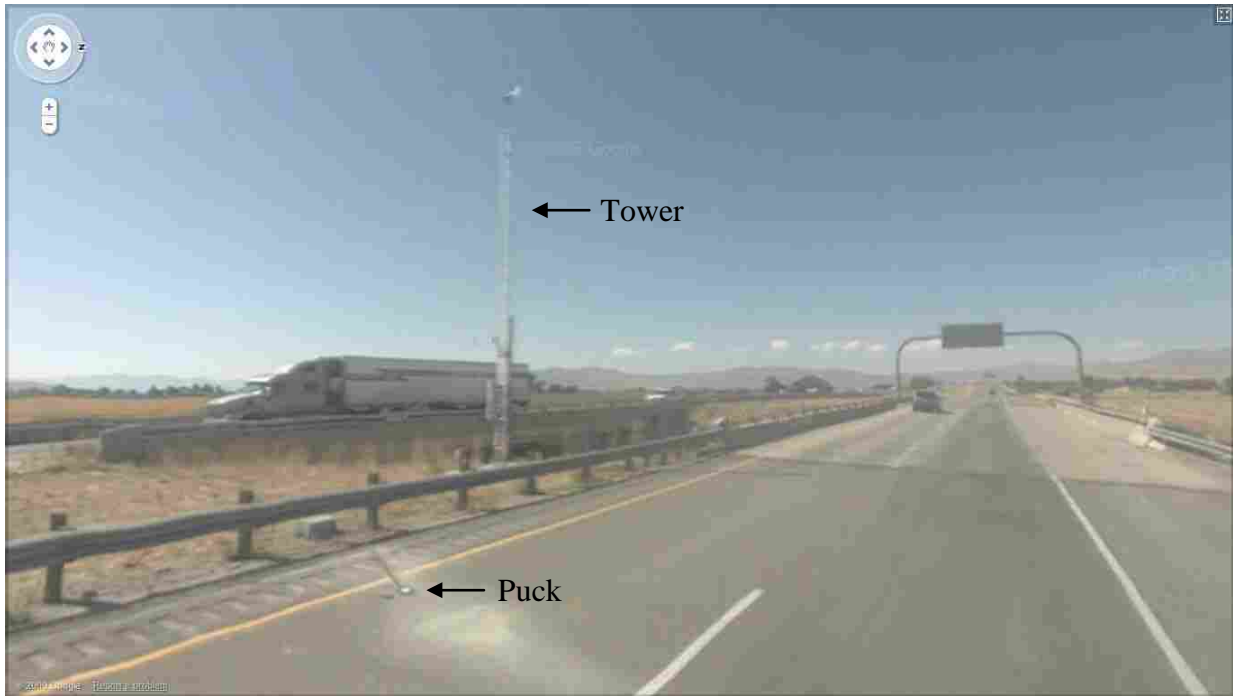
Google Street View showing asphalt pavement at station UT28 (Google 2010).
